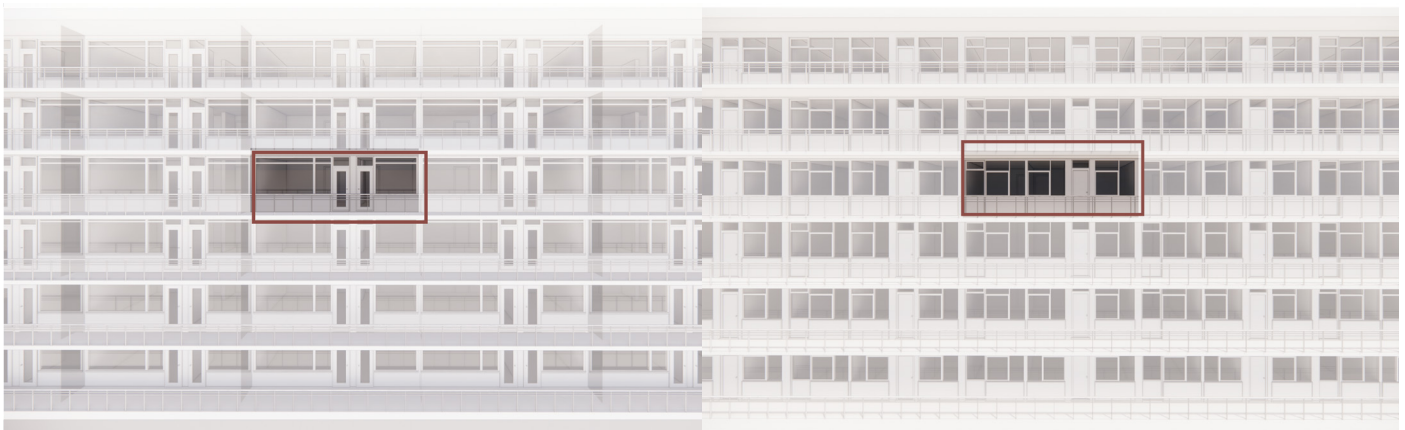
| Glazed Façade Apartment Extents for Private and Public Balcony
